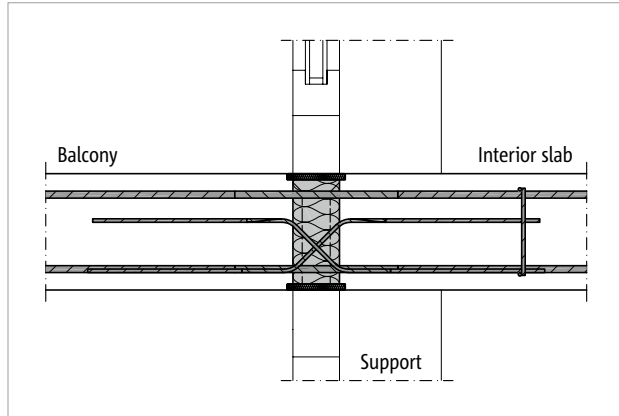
Schöck Isokorb® T Type CD: Installation section; one-way spanning
